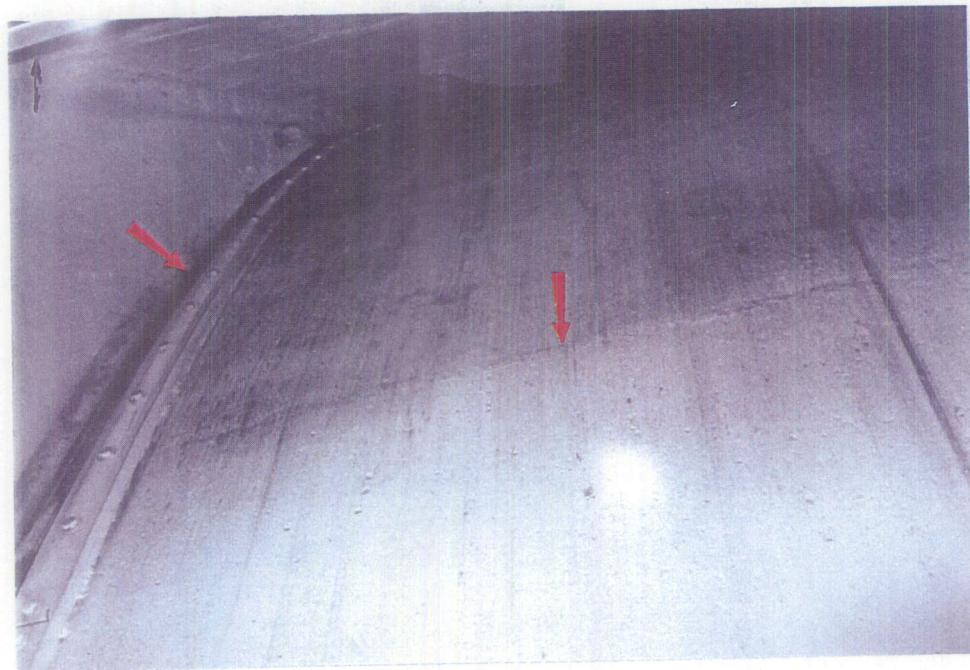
Morris Dam - 70' x 18' Drum Gate #3 - Upstream faceplate. Down arrow points to upper extent of good paint. Other arrow points to left upstream side seal assembly.. - (9/10/98).
